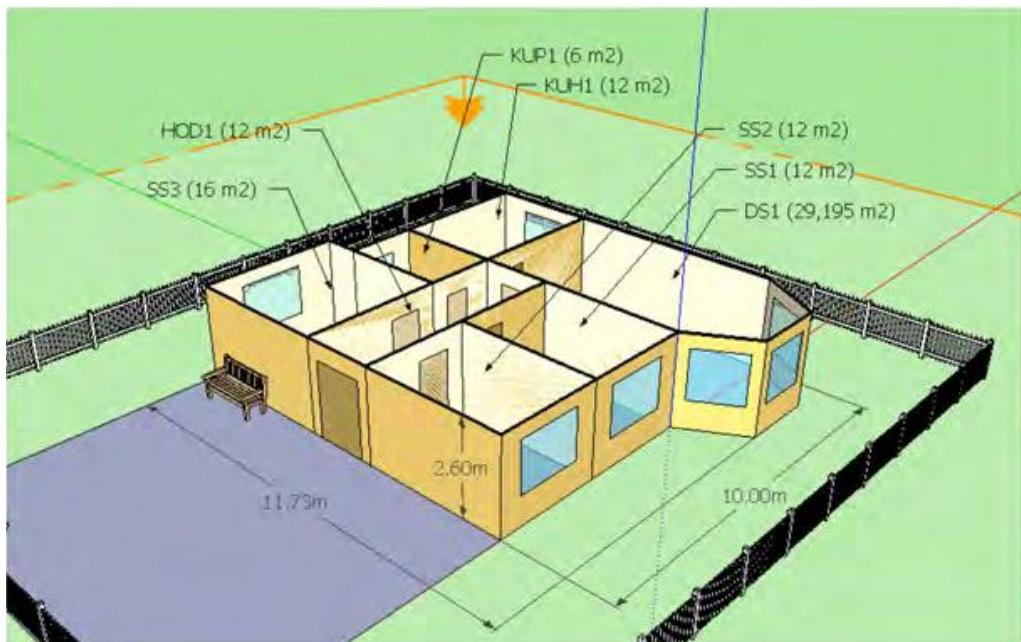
Arrangement of the rooms on the ground floor of the passive house
